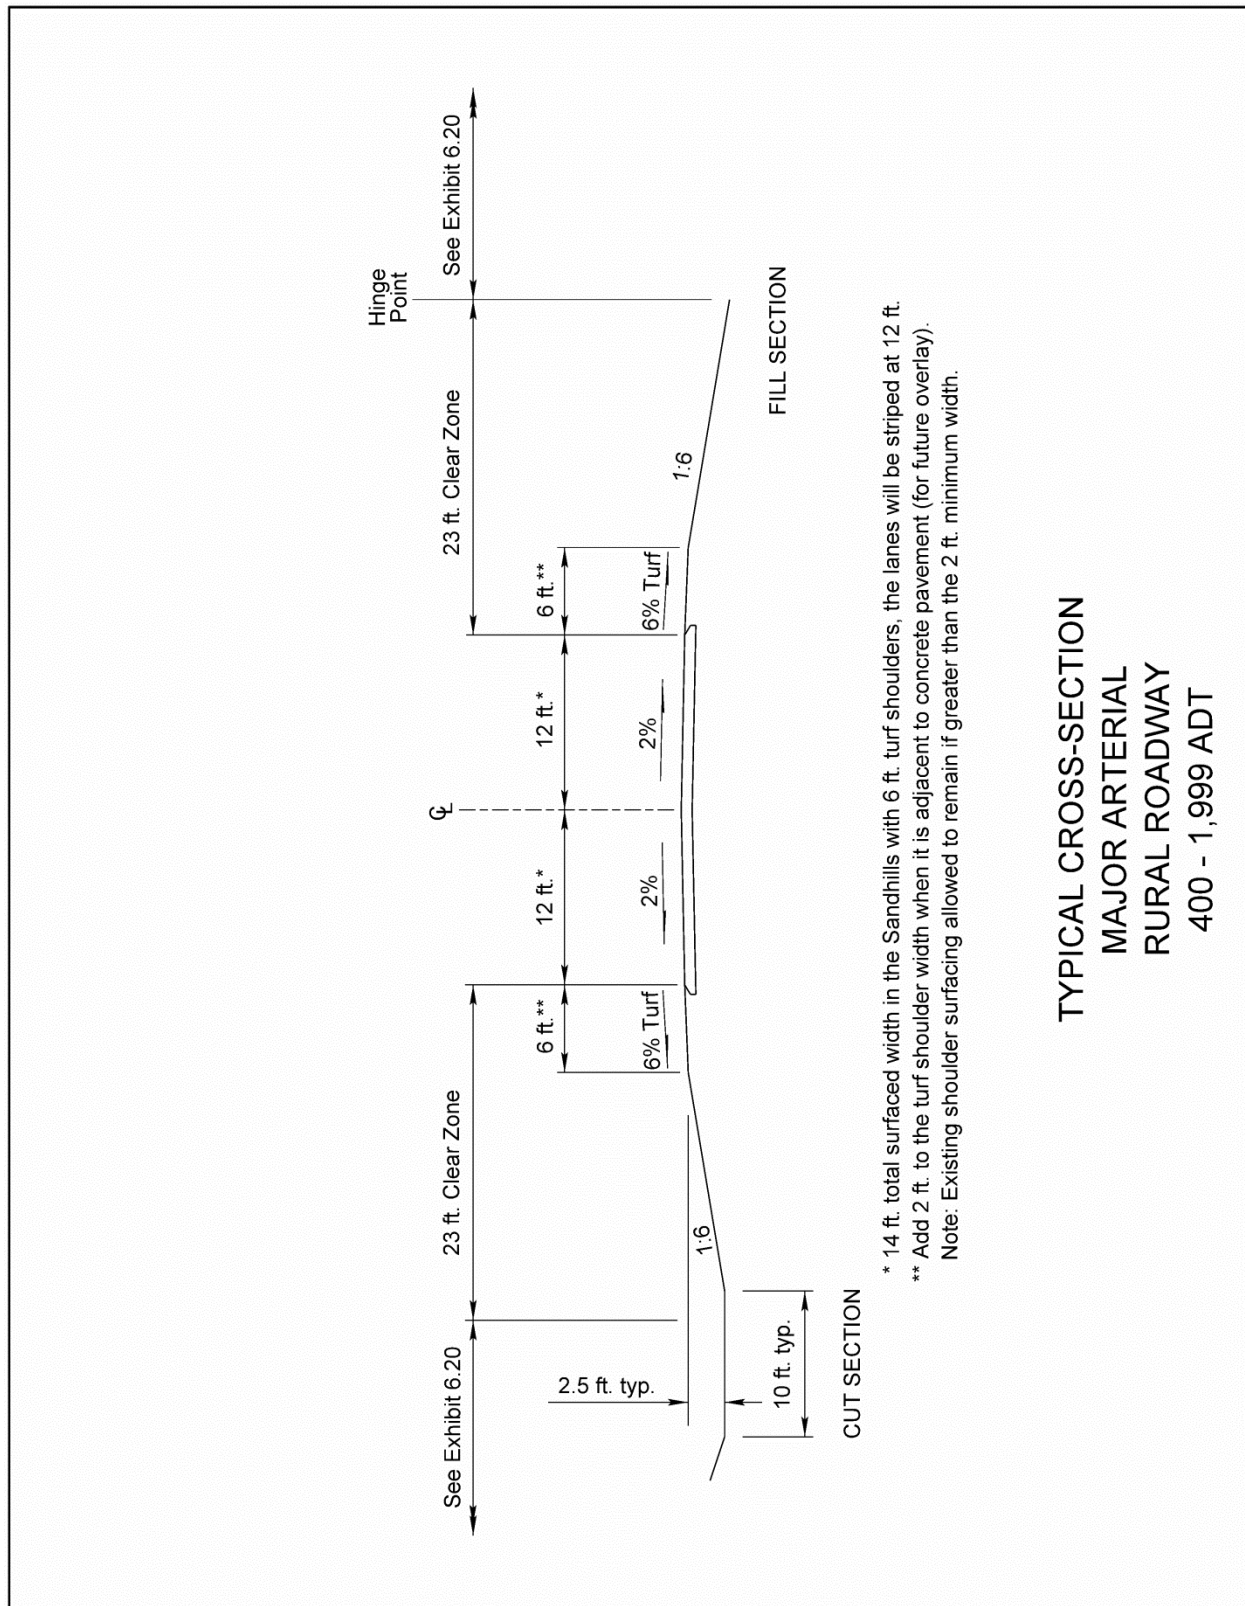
Typical Section - Rural Major Arterial 400 to 1,999 ADT
